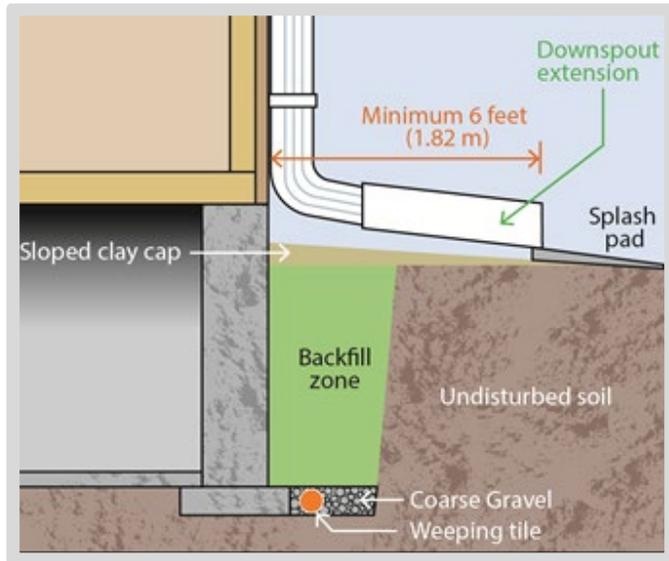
Extend downspouts a minimum of 4-6 feet (1.21-1.83 m) away from building to prevent recirculation of roof drainage at the foundation. Source: The City of Calgary.
